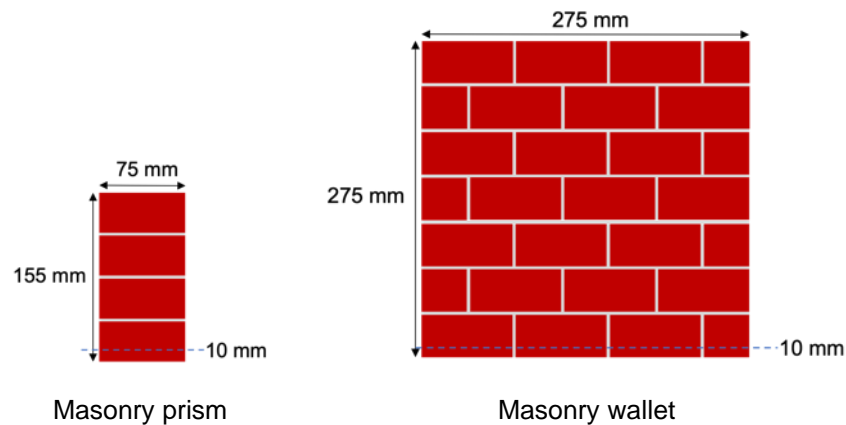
Masonry assemblies submerged in a water depth of 10 mm
